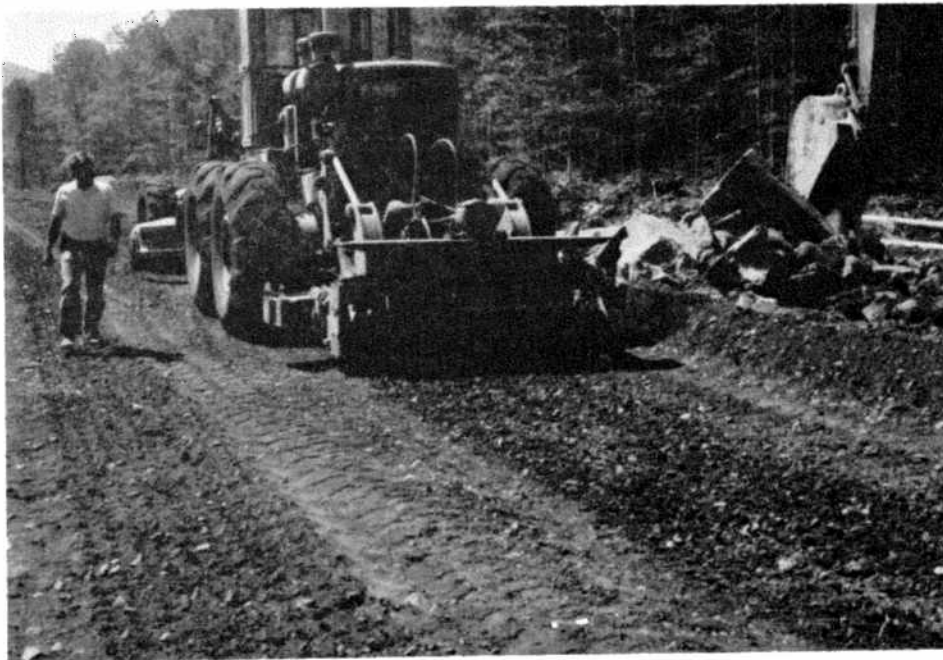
Rotating Mill Crushing the Material In Place With Optional Vibratory Engine
